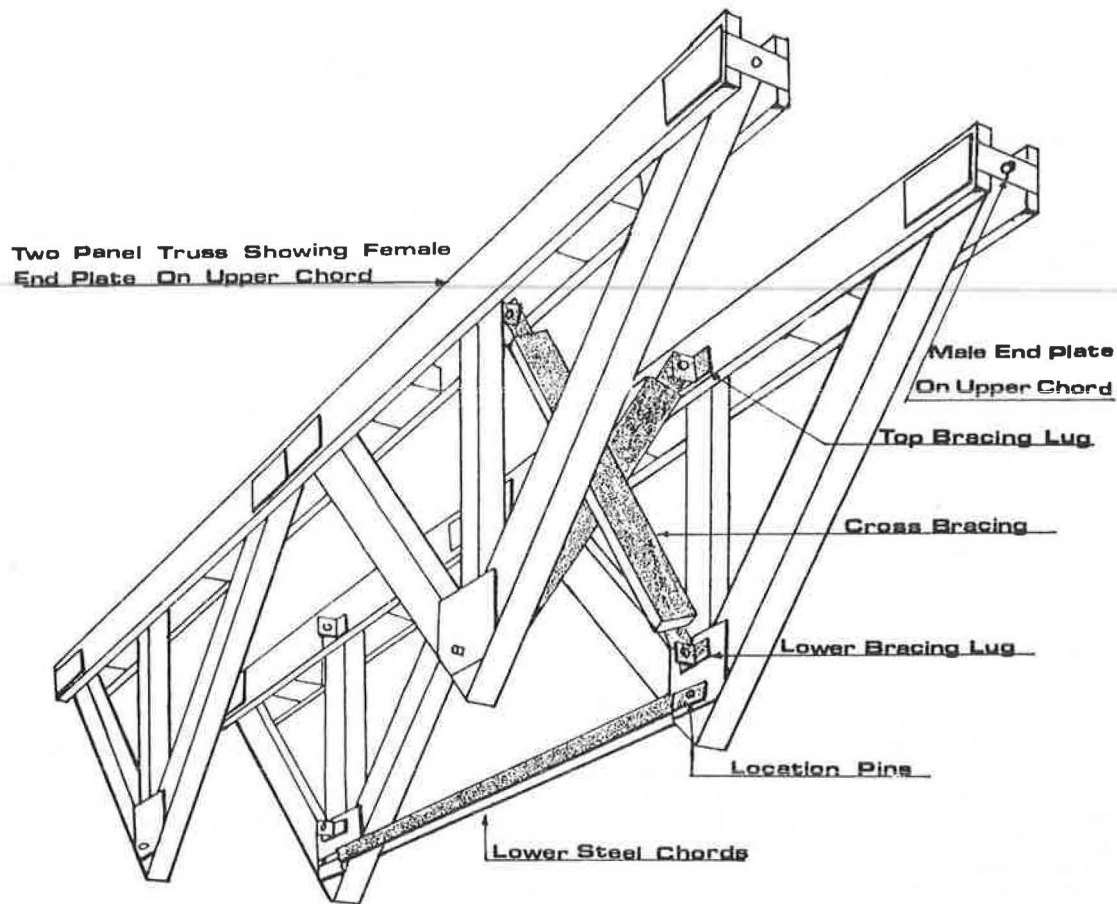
UNIDO bridge system: four triangular panels shown with connecting elements.
